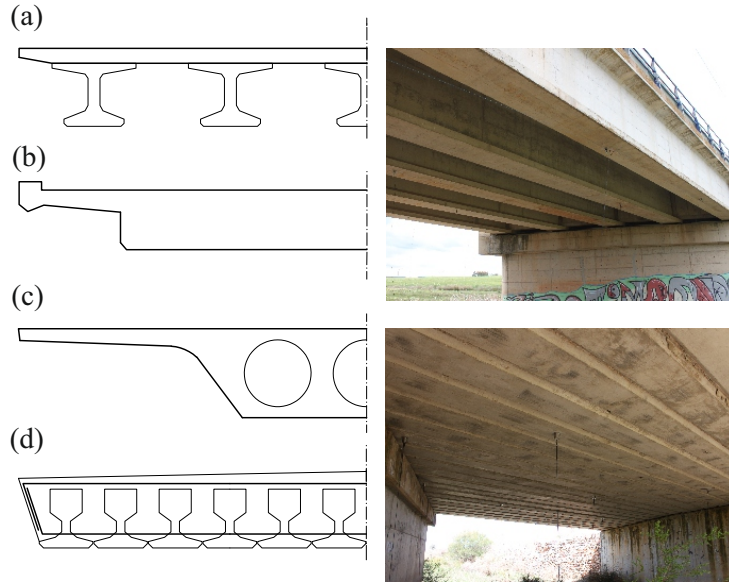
Left: (a) pre-stressed concrete girder deck; (b) solid concrete slab; (c) voided concrete slab; (d) filler beam pseudo-slab. Right: photographs of a girder deck (top) and a pseudo-slab deck (bottom) in Madrid-Sevilla HS line.
